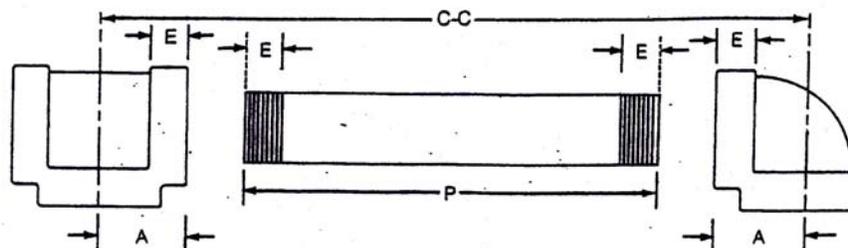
Pipe assembly to be constructed by John using standard pipe fittings and a cut piece of pipe.
